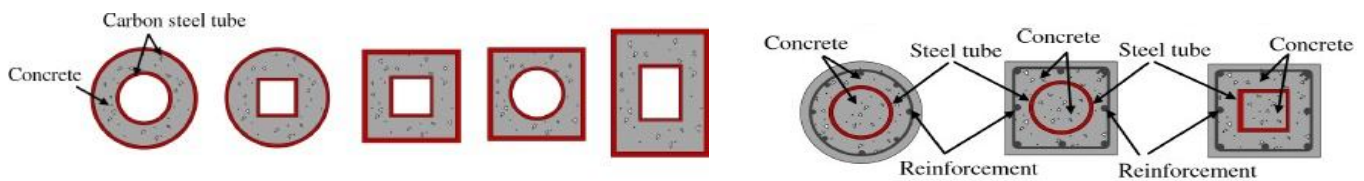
Typical Cross-Sections of Concrete Filled & RCC Filled
